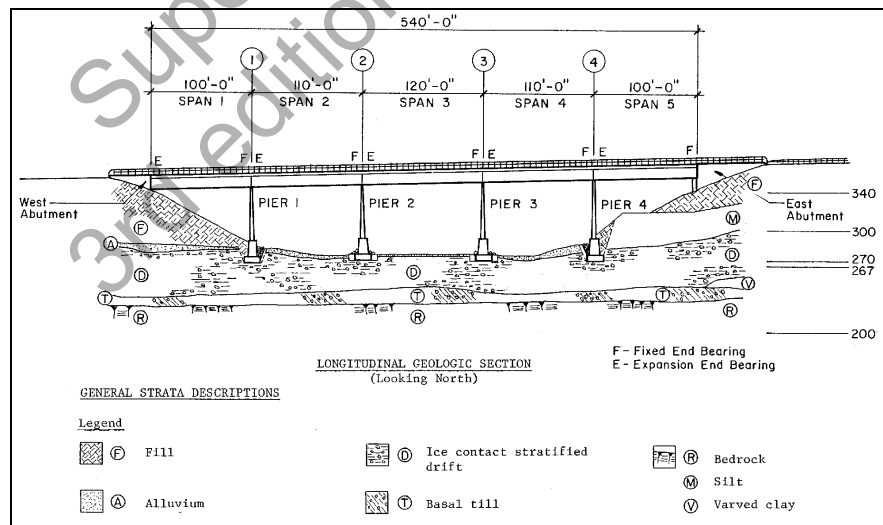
South elevation - Schoharie Creek Bridge showing key structural features and a schematic geological section.⁽²⁾
